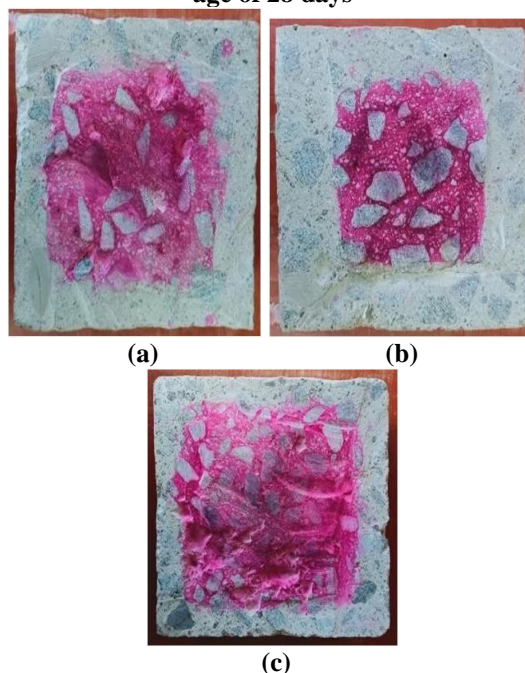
Cross sectional view of tested specimen samples (a) NAC (b) RAC (c) RAC- CNS-DPA
